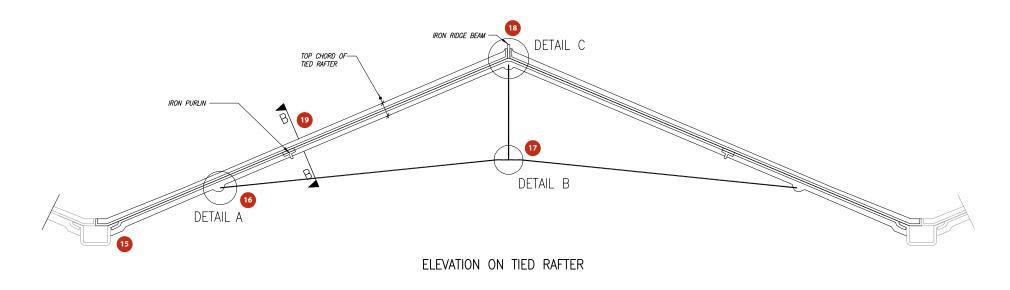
Key plan showing subject of detail photos of canopy bracket located in bay 4 on platform 2
